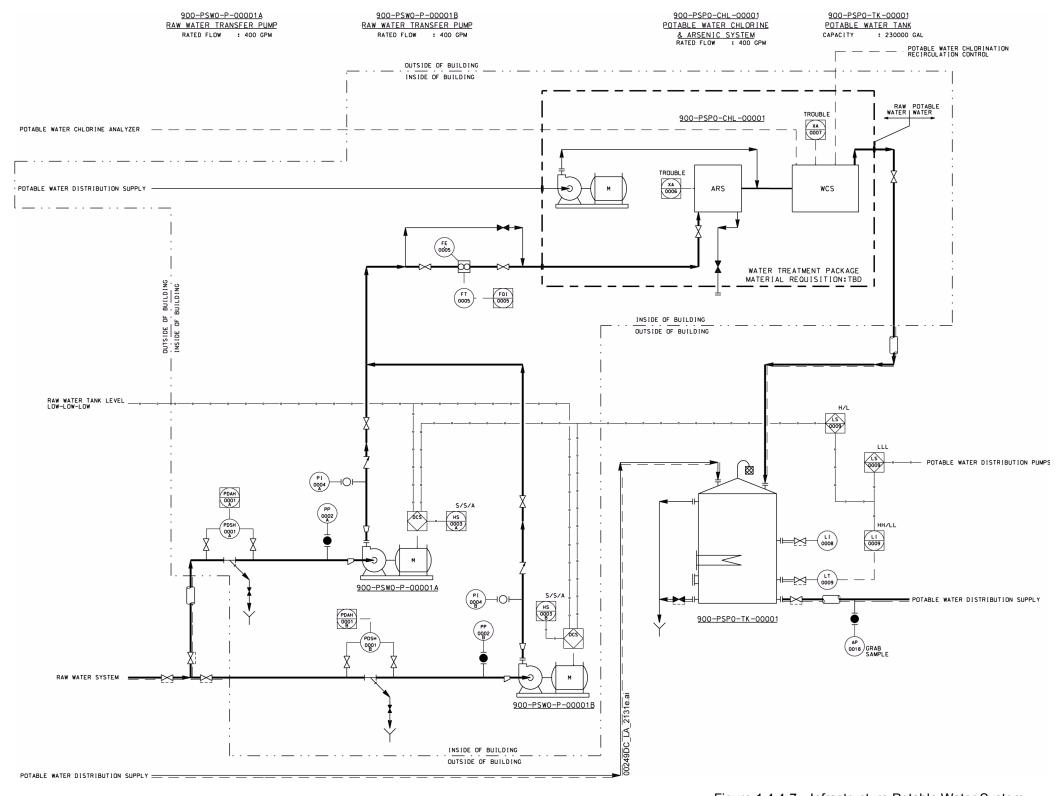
Infrastructure Potable Water System Supply Piping and Instrumentation Diagram
